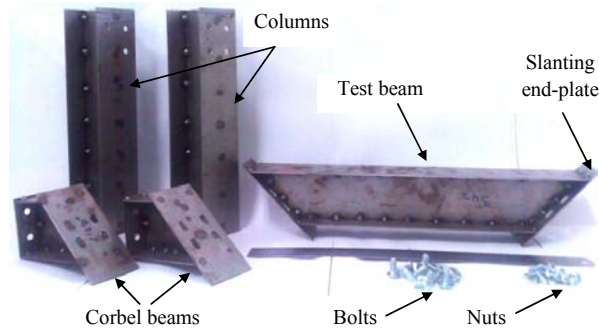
Parts of a Steel Frame with Slant End-plate Connection (Small-scale Specimen)
